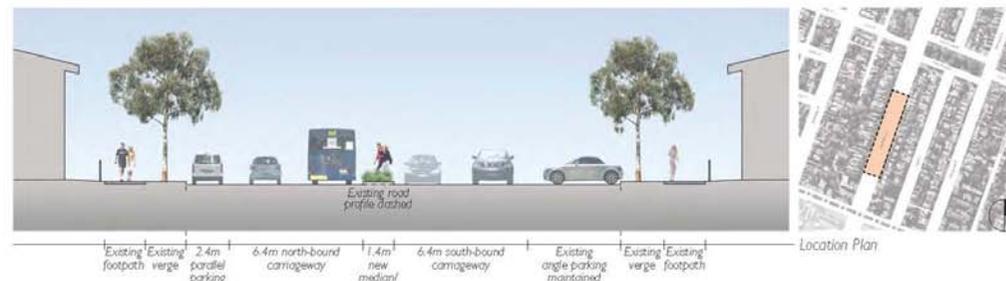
TYPICAL SECTION STREETScape TYPE 2 - PARALLEL PARKING AND ANGLE PARKING, 1:200 @A3
